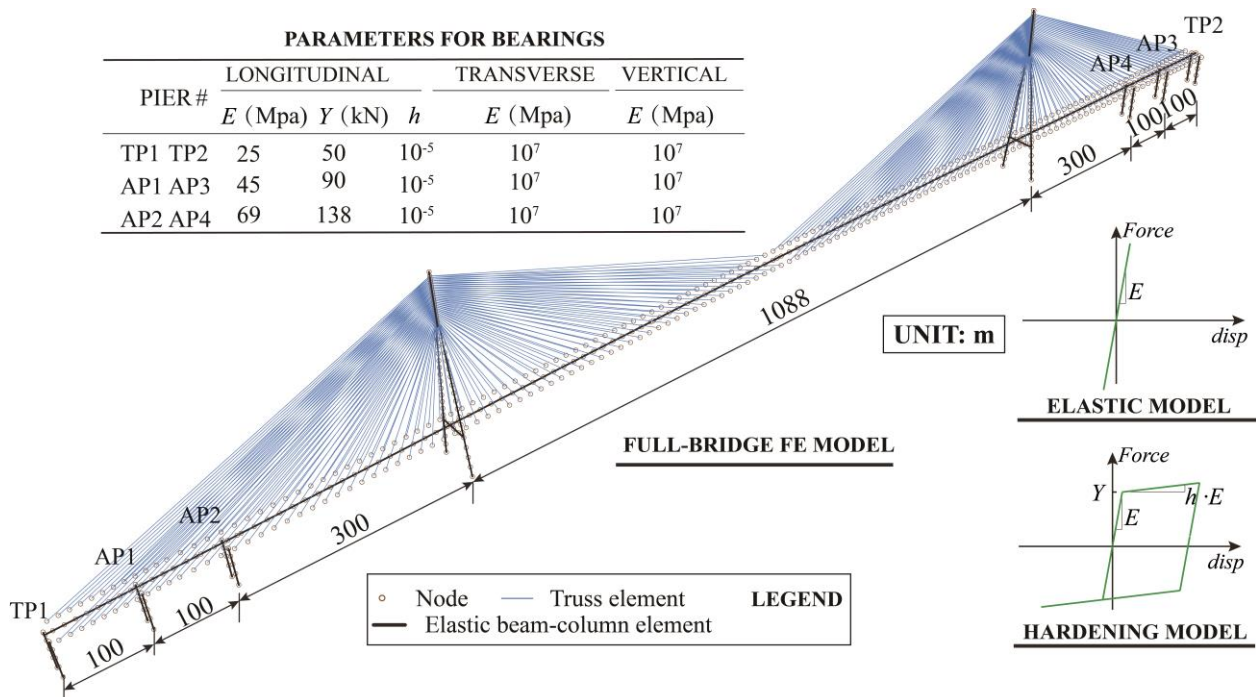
Schematic illustration of elastic full-bridge finite element modelling of the Sutong Bridge
